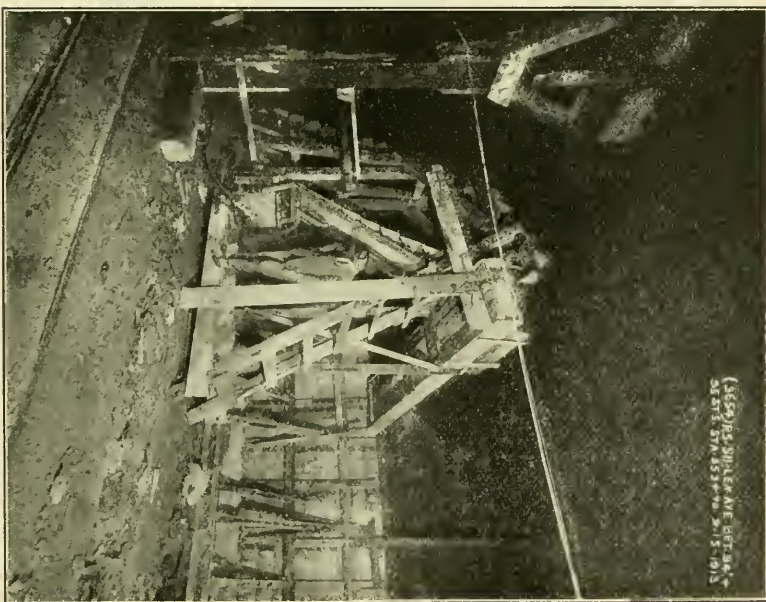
CONTINUOUS TRAVELER USED TO HANDLE CONCRETE IN TUNNEL, SECTION II.
